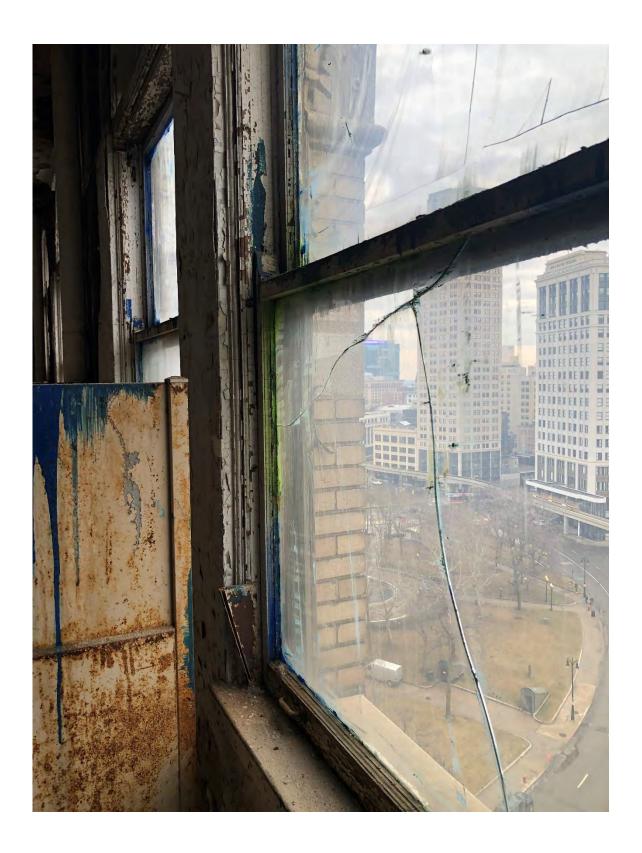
Interior, 12<sup>th</sup> Floor, Window Detail, Looking Southeast. 2/4/19
